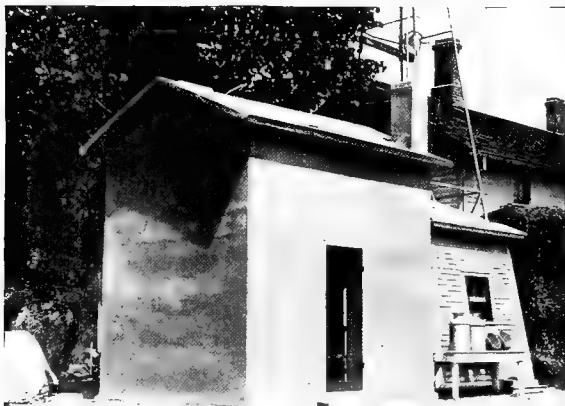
Monolithic Milk House of Charles S. McNett, Cary, Ill. One of a dozen concrete structures on Mr. McNett's Farm.
